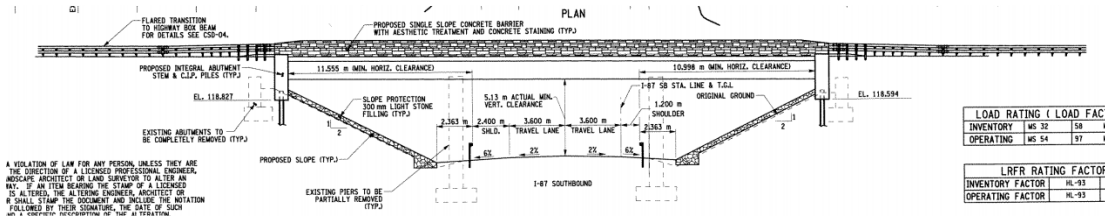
Elevation view of Arthur road over I-87 S.B.
